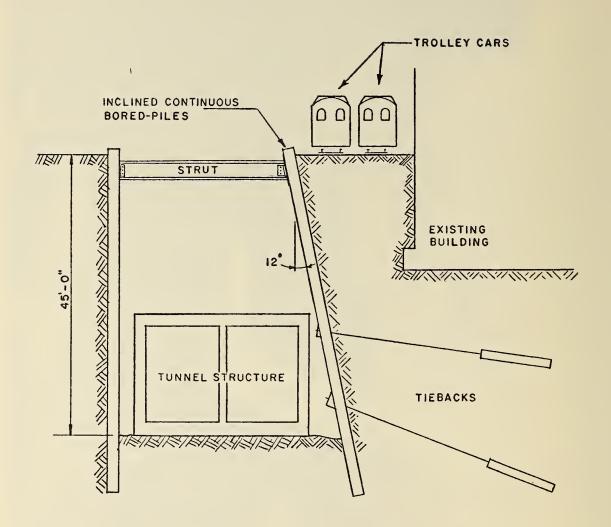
EXAMPLE OF INCLINED BORED-PILE WALL
